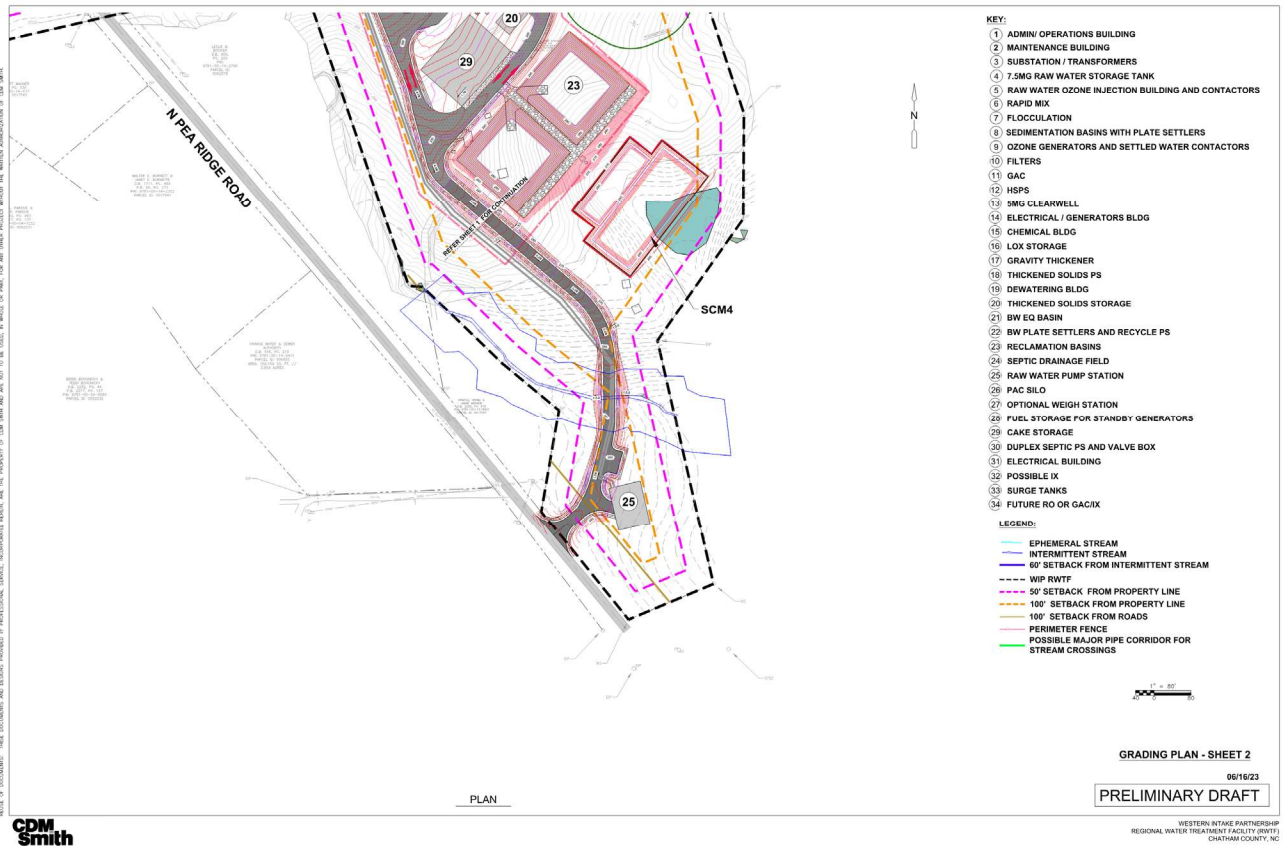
| Grading Plan for RWTF – Sheet 2 of 2
